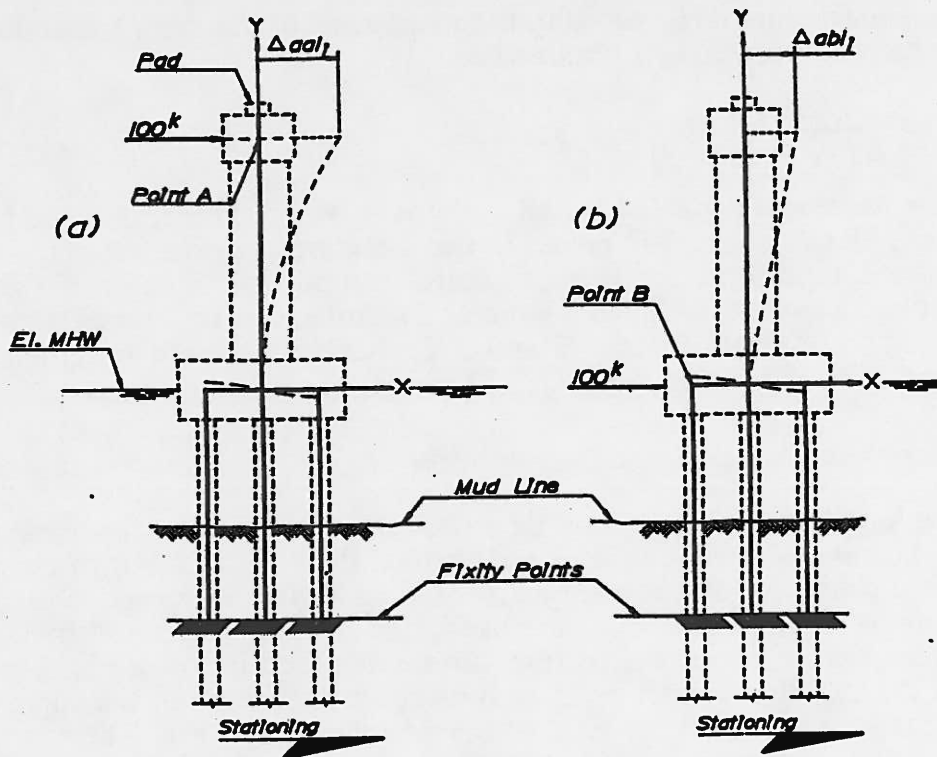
3-D Pier Model Shown in End Elevation with Longitudinal Virtual Forces Applied: (a) At Point A; (b) At Point B
